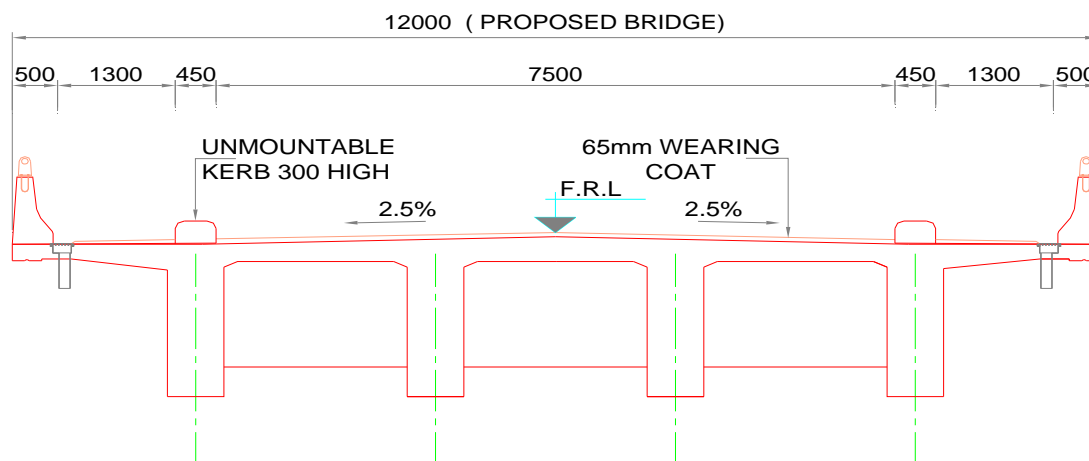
TYPICAL CROSS SECTION- TYPE-0
